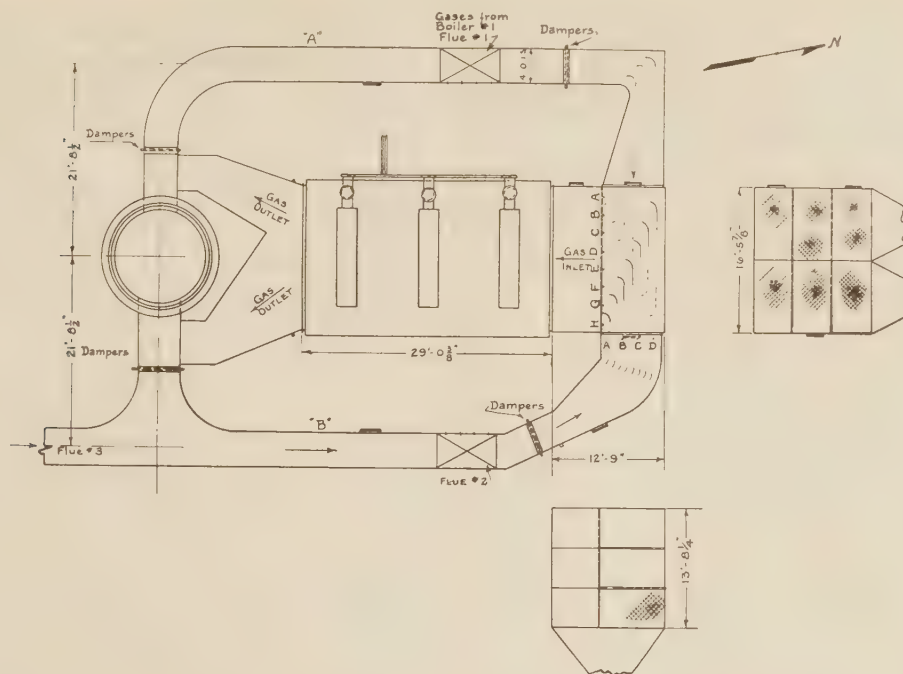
PLAN OF PRECIPITATOR INSTALLATION AND ELEVATIONS OF GAS MIXER AT STATION No. 8
